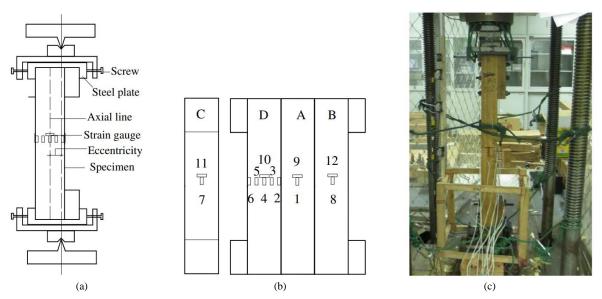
Eccentric compressive set-up for engineered bamboo columns: (a) schematic diagram of the test setup [76]; (b) arrangement of strain gauge at the surface of specimen [76]; and (c) actual test set-up [76]
